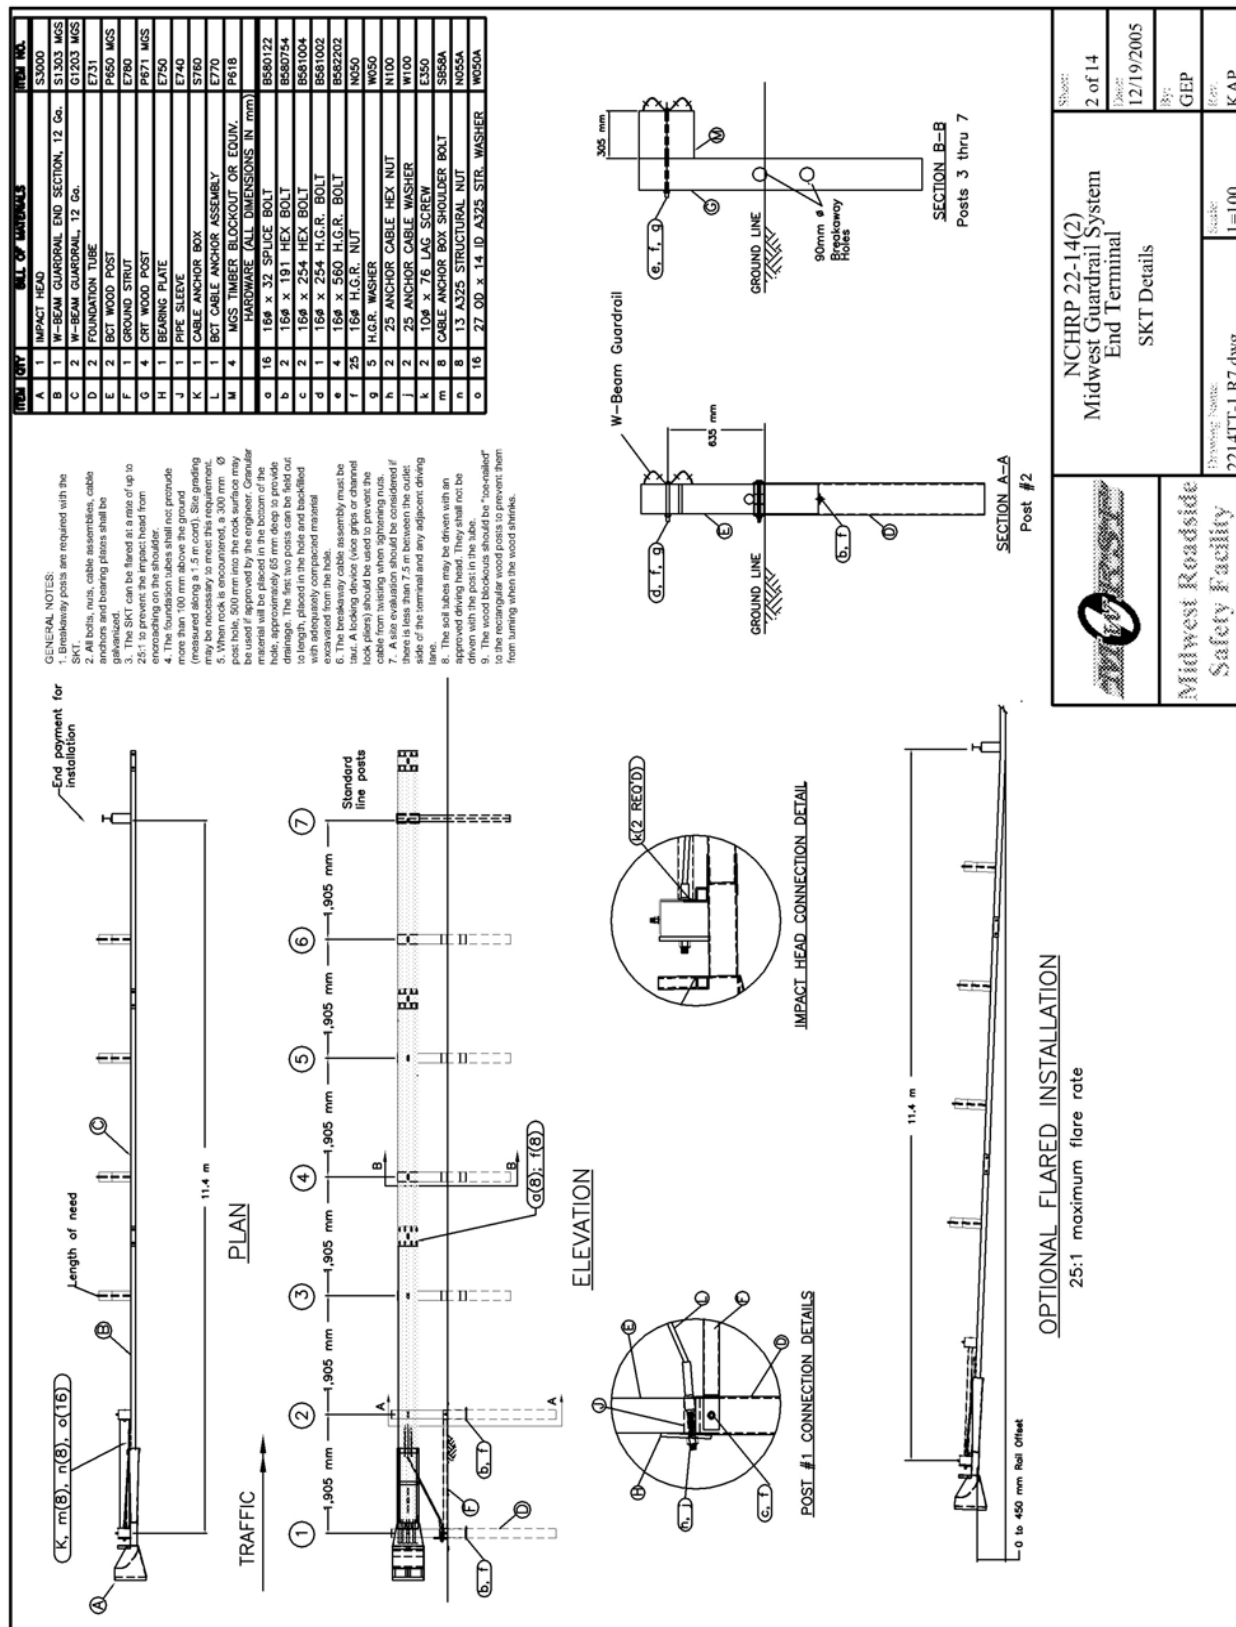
Midwest Guardrail System End Terminal - SKT Details
